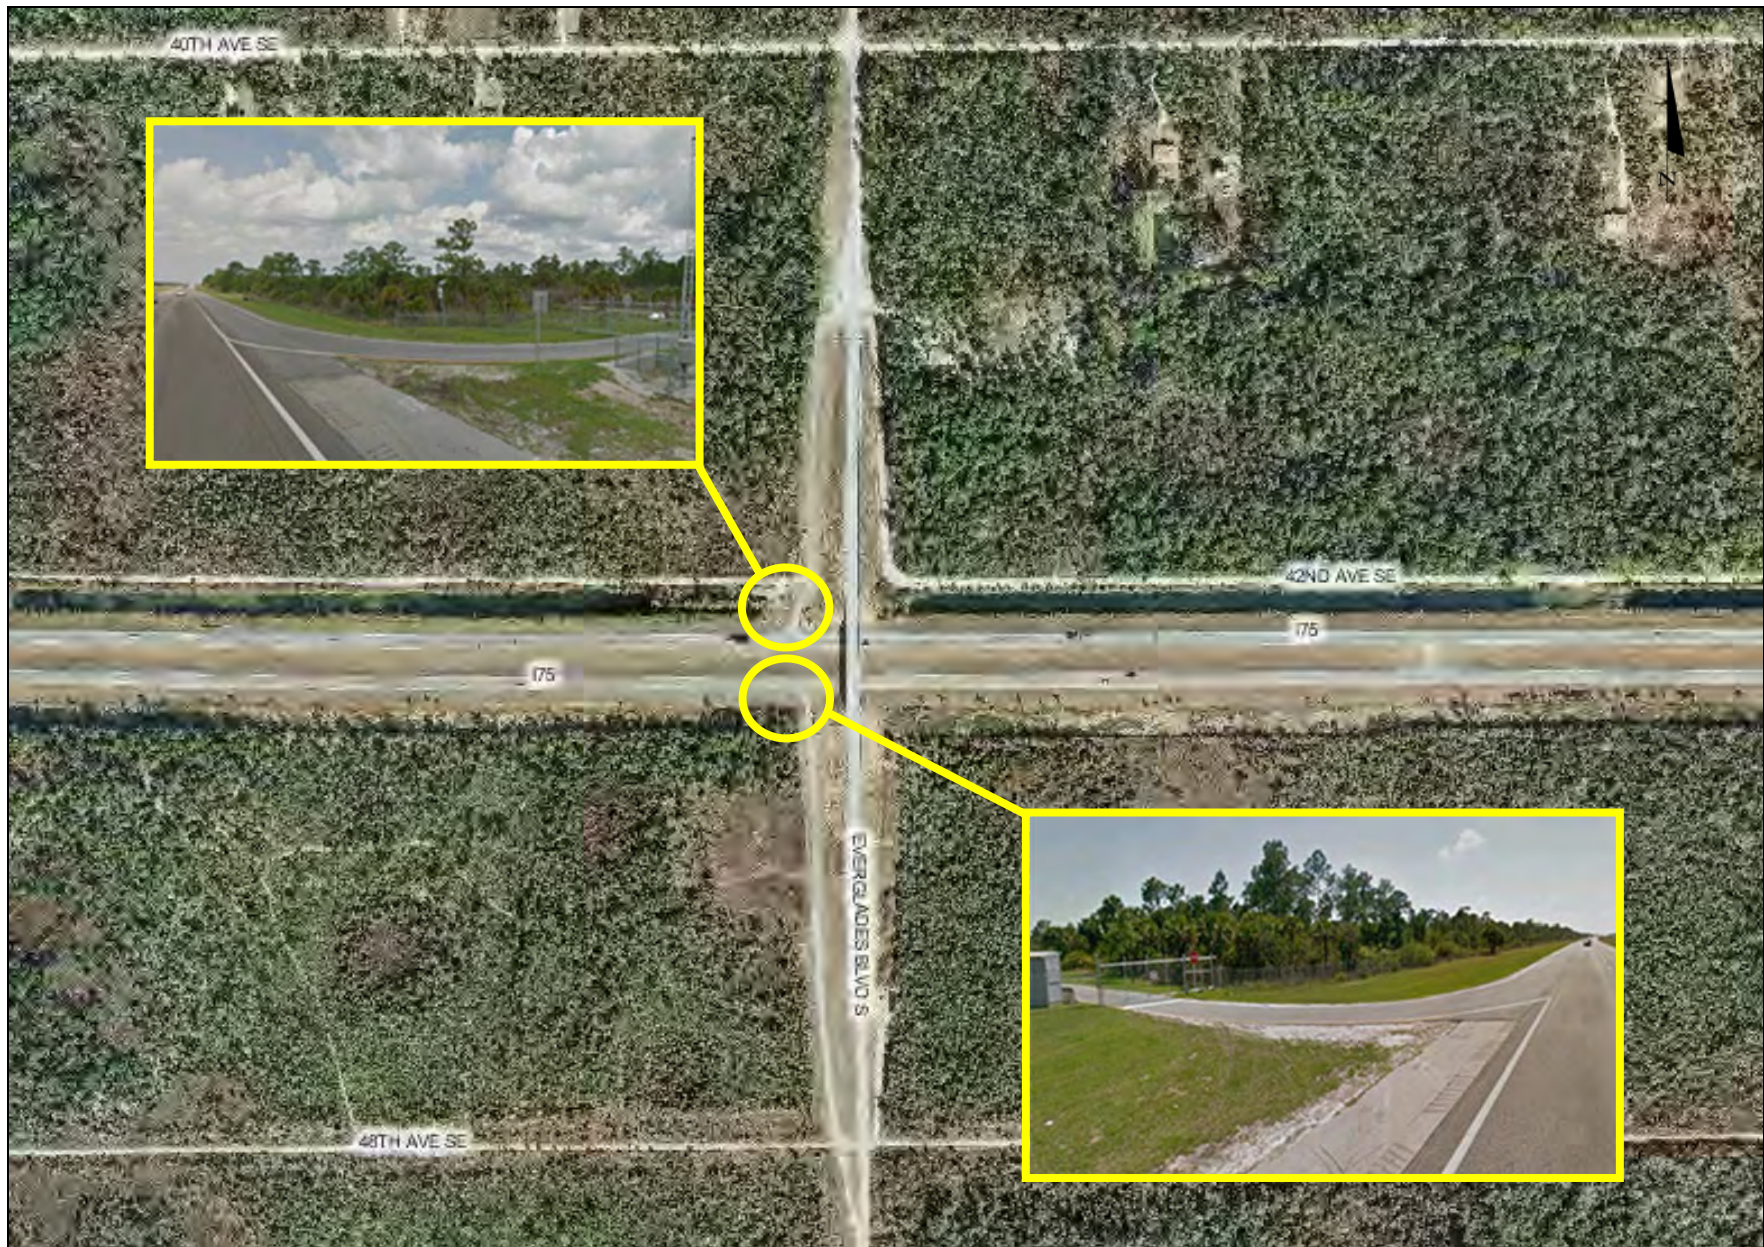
Existing Everglades Boulevard Overpass/Temporary Access Ramps
